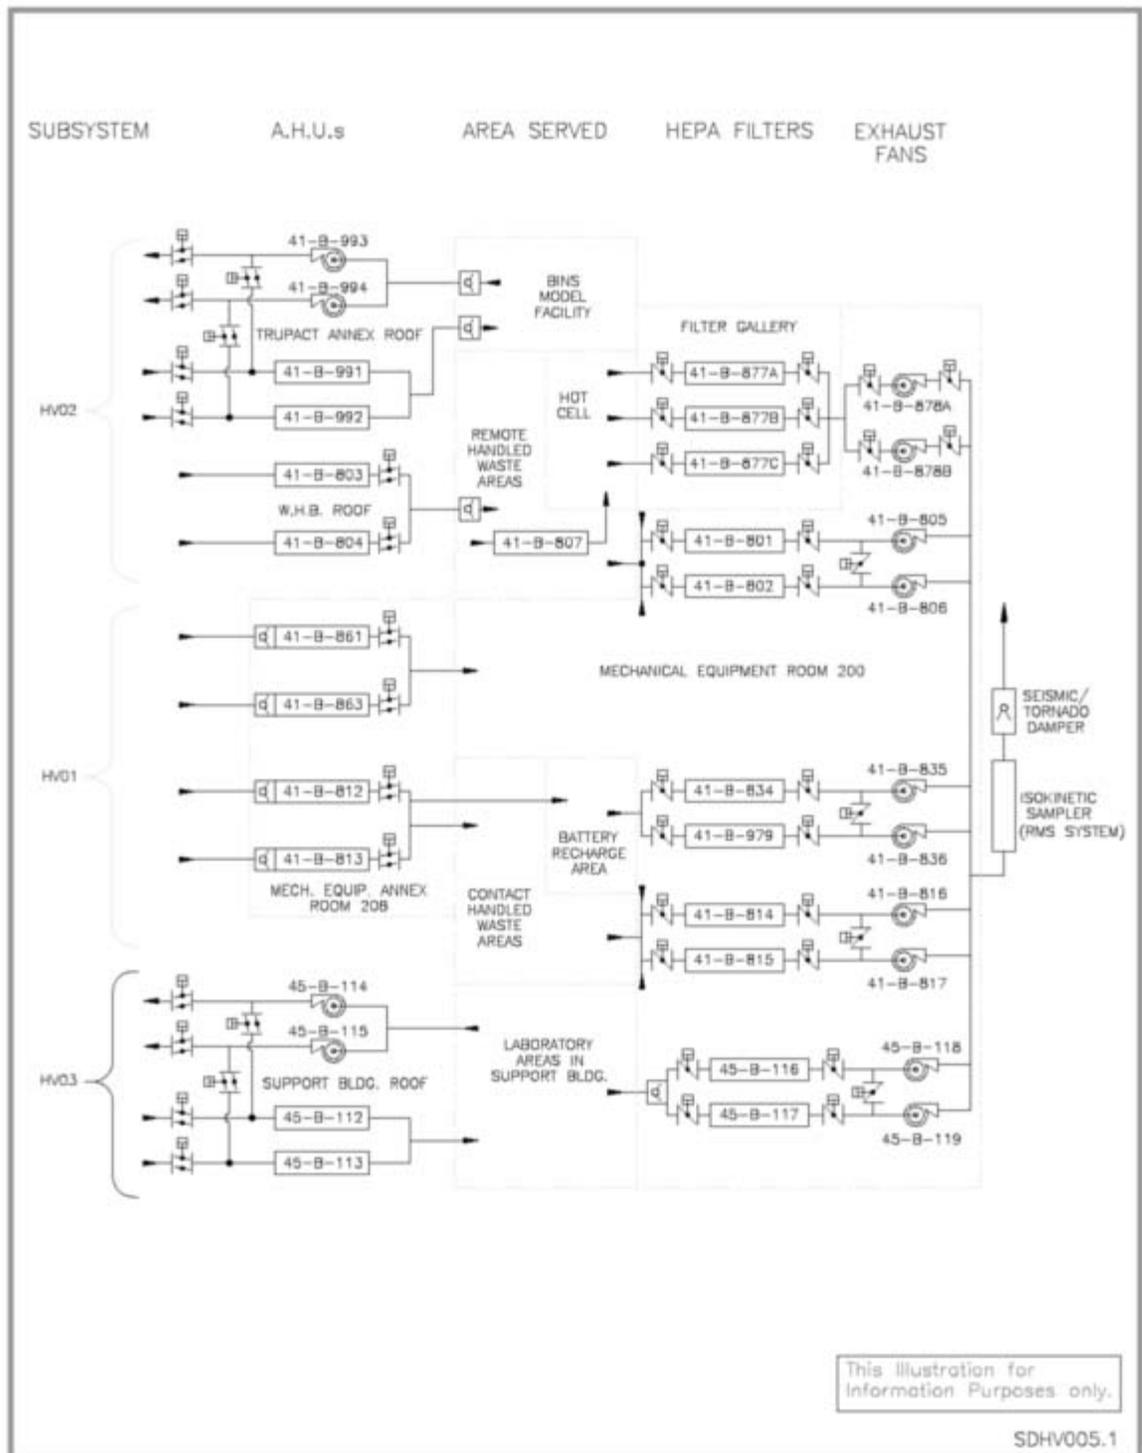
HVAC Equipment Configuration in Surface Waste Handling Facility
